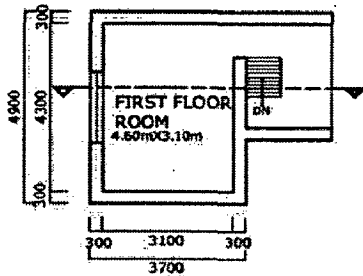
First floor plan of residence 2, in Vadakkencherry agraharam
